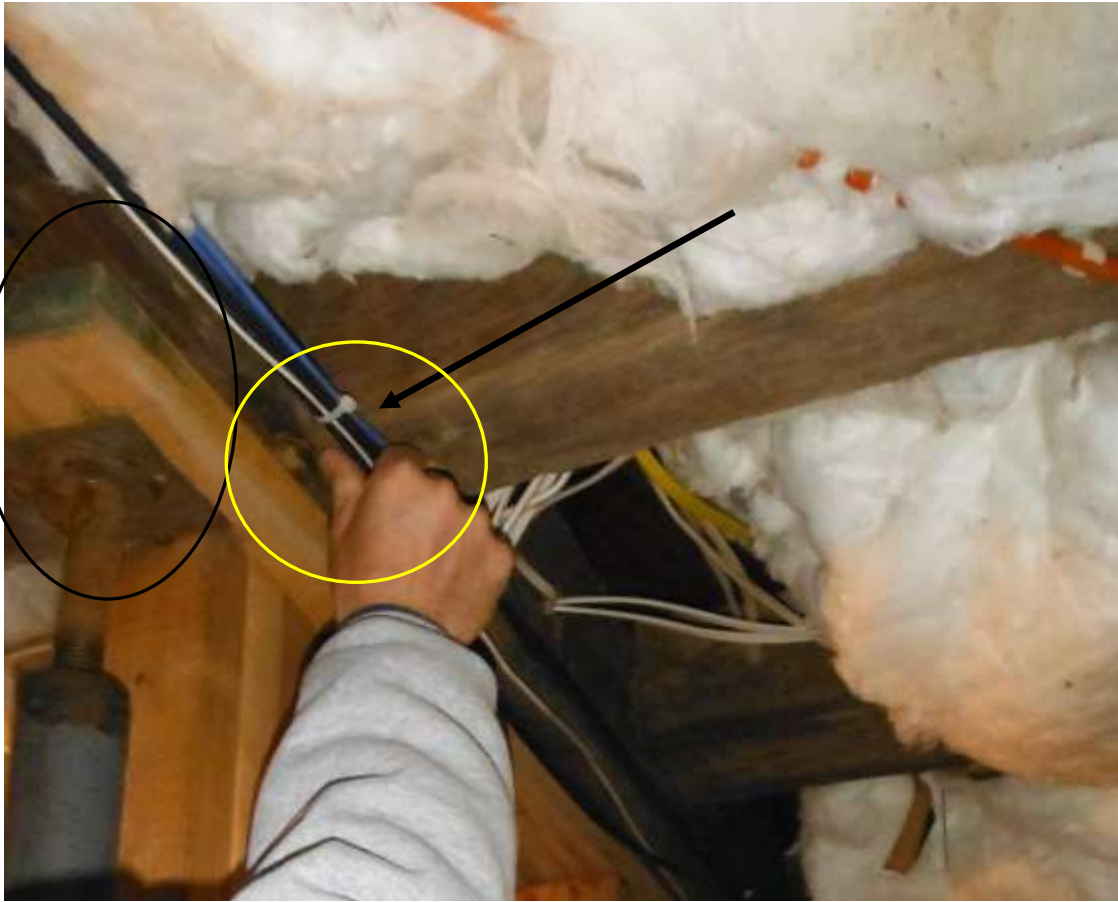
Handyman repairs; have structural engineer evaluate repairs and structure and advise on all needed structural repairs.
